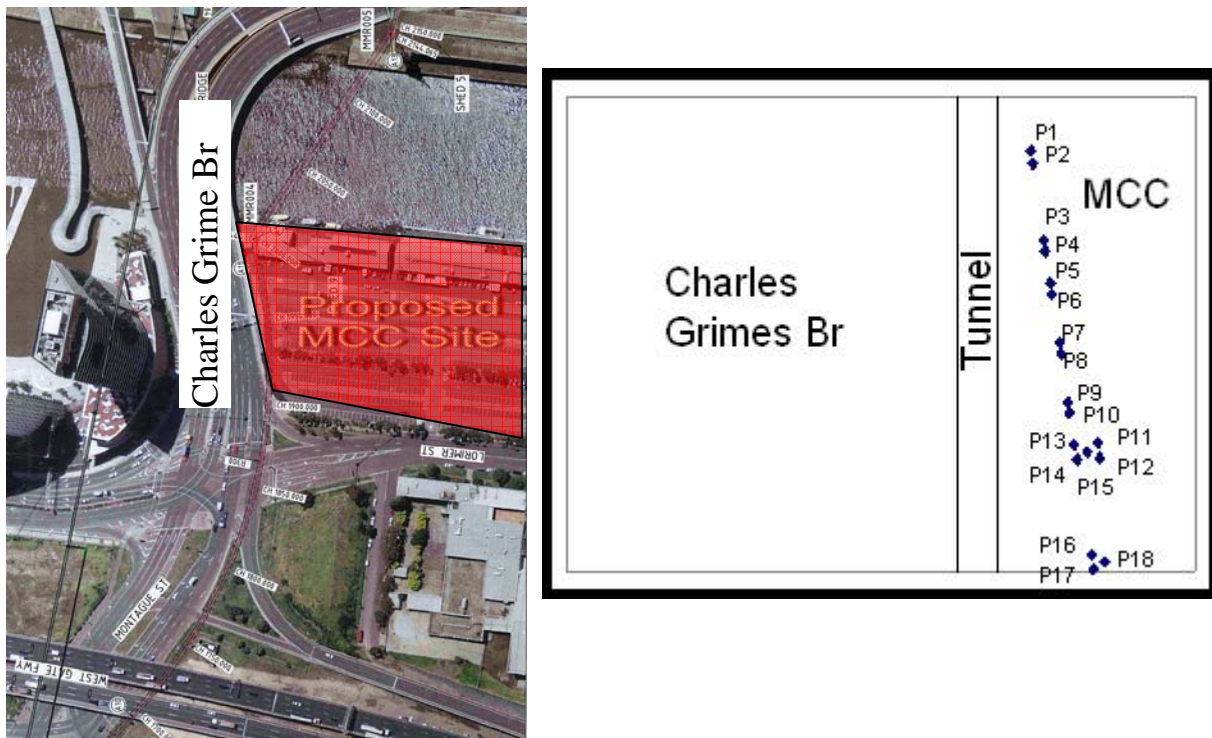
Eighteen piles of the proposed MCC pile foundation that are within the tunnelling zone of influence
